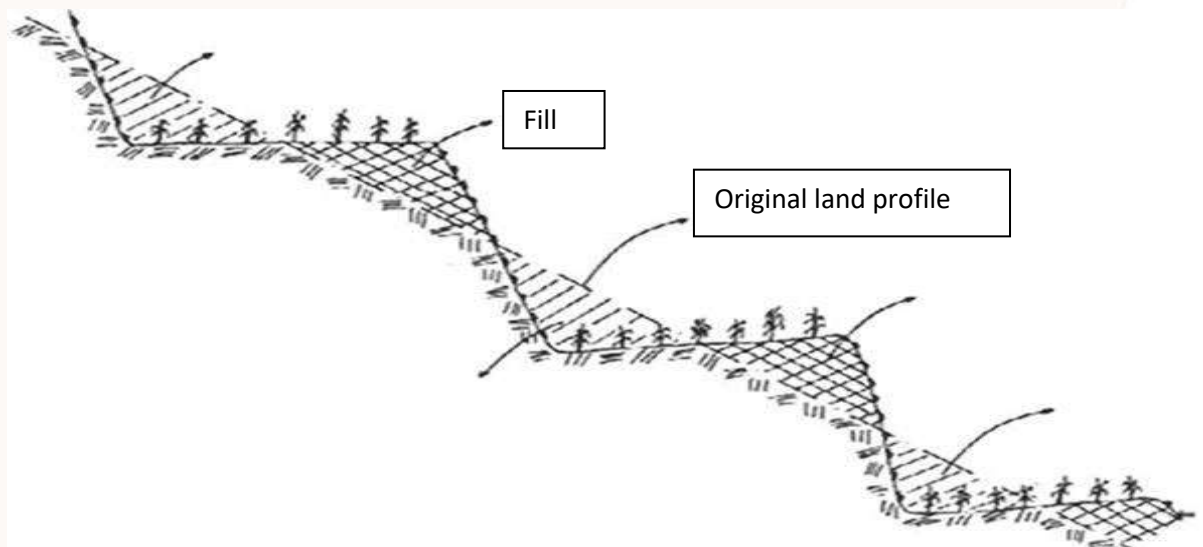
A sketch of a typical bench terrace (FAO 2000)
